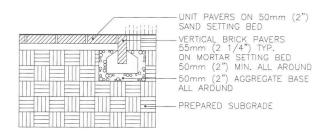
Brick paving edge on mortar setting bed. Bricks mortared at edge joint. Mortar struck below pavement base. Not used in cold zones.
